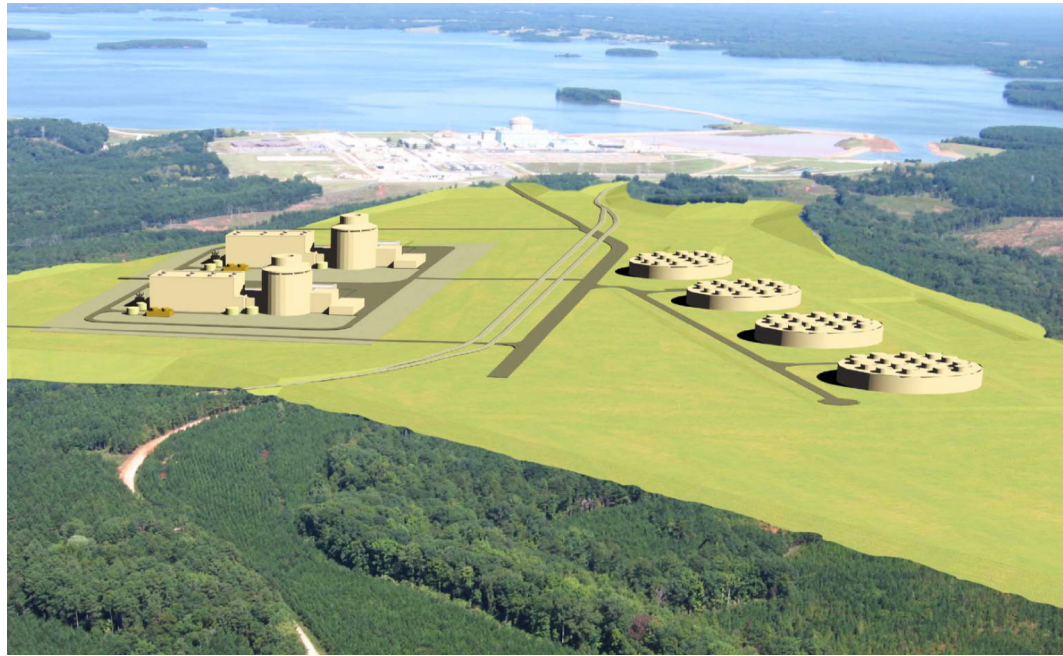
Artist's Conception of New AP1000 Units Adjacent to Existing Nuclear Facility
